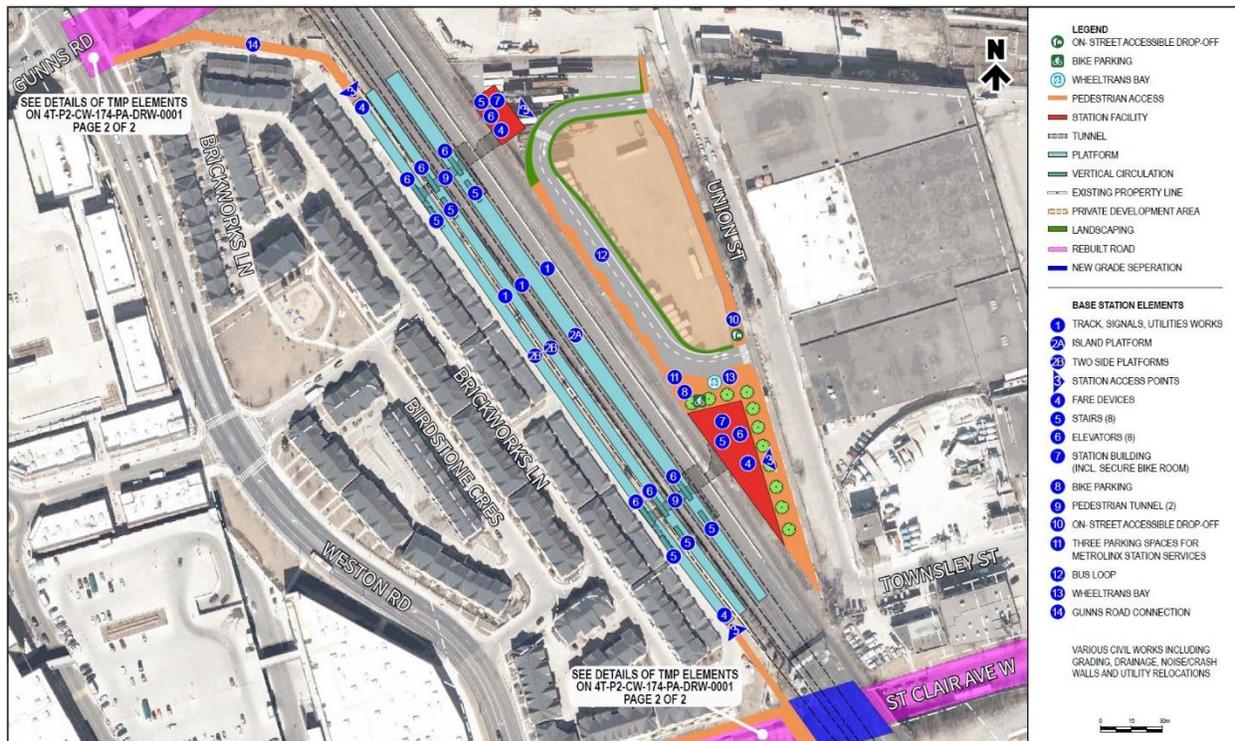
Conceptual plan of St. Clair-Old Weston Station. Source: Metrolinx (December 2020). Note: Station plan shown above is indicative, and does not represent a final design.
